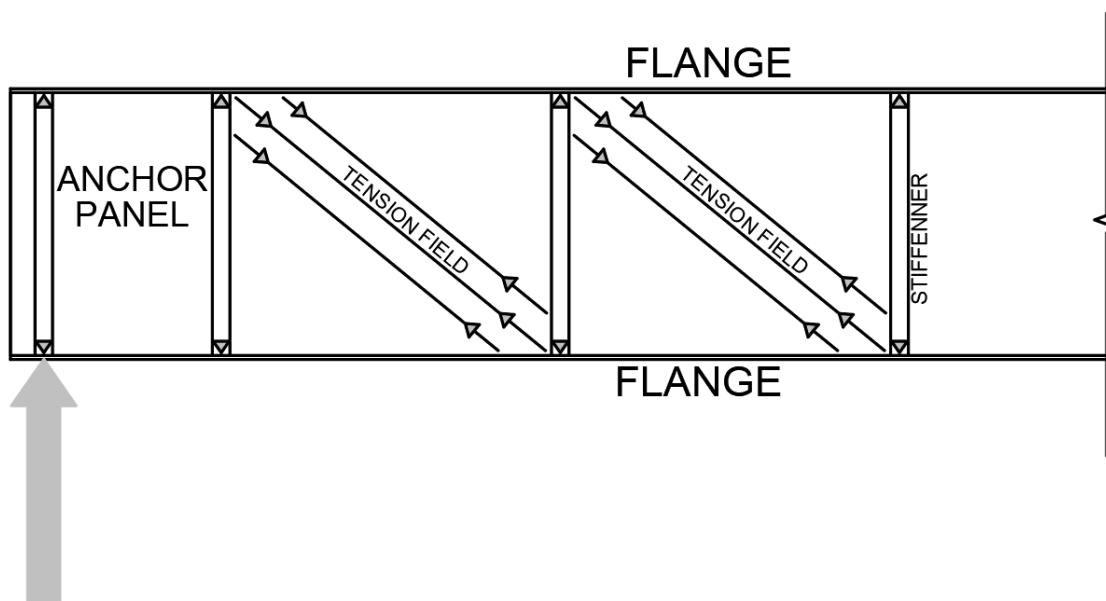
Tension field action in a welded girder with stiffeners (Parrott, 2011).
